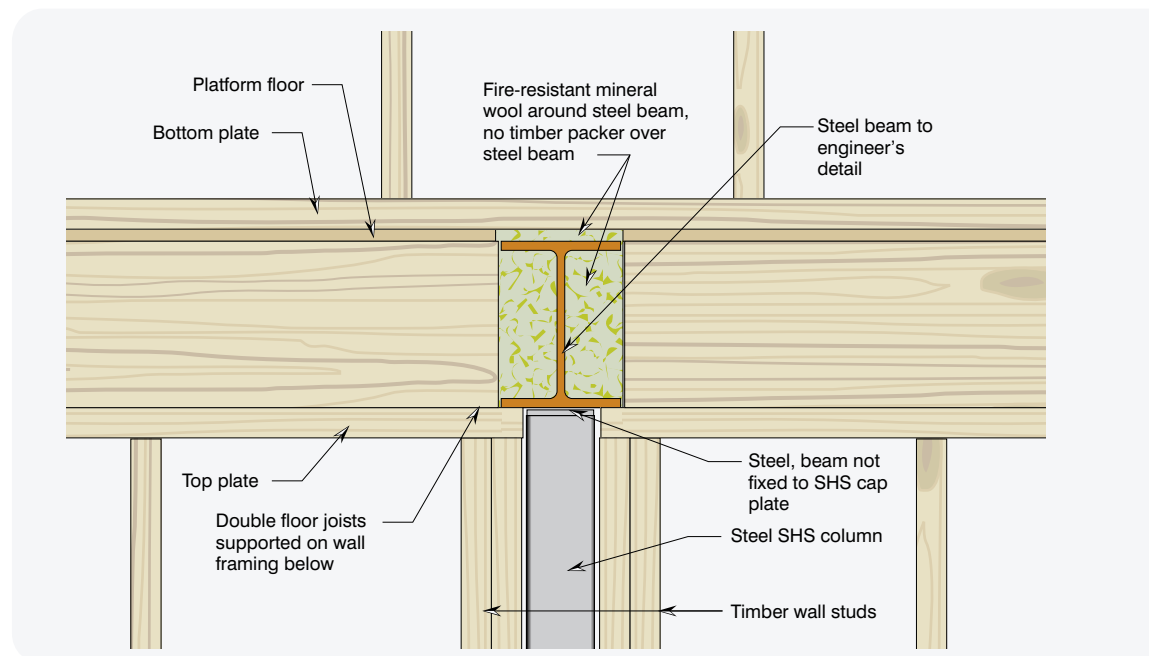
Details of the steel beam pocket in timber-framed separation wall – elevation view.
